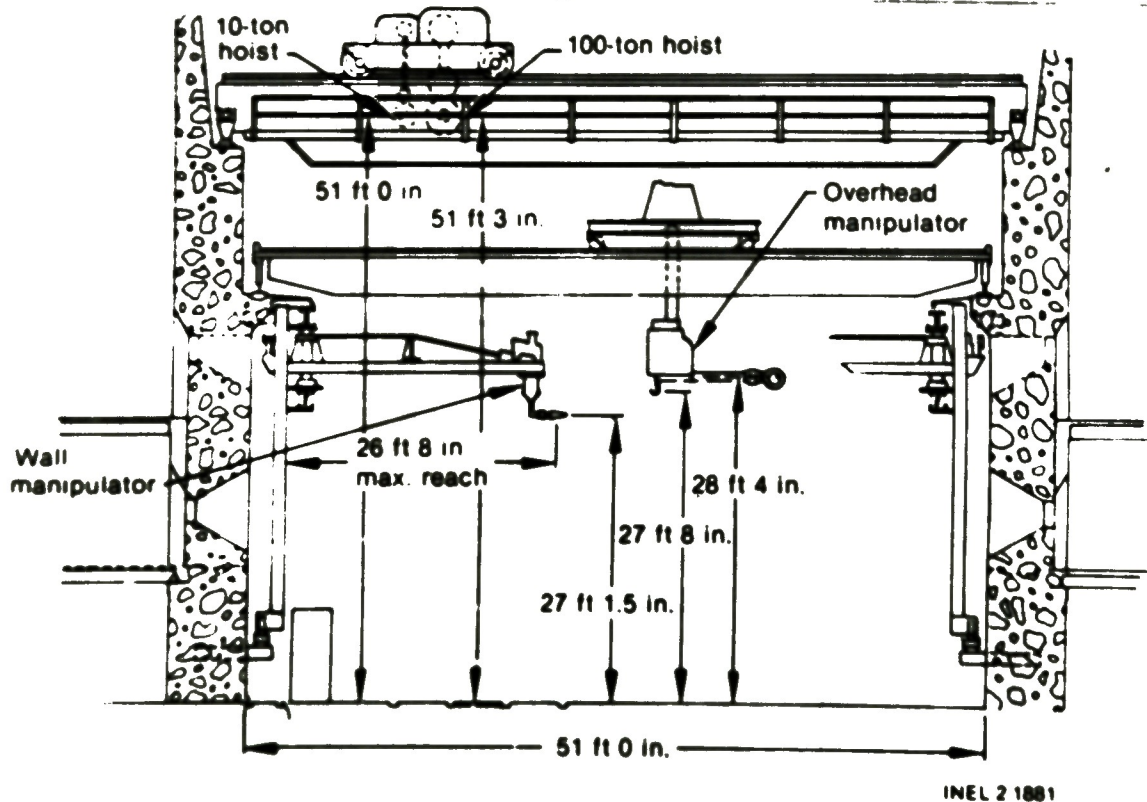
Elevations of remote handling equipment in the TAN-607 Hot Shop.
